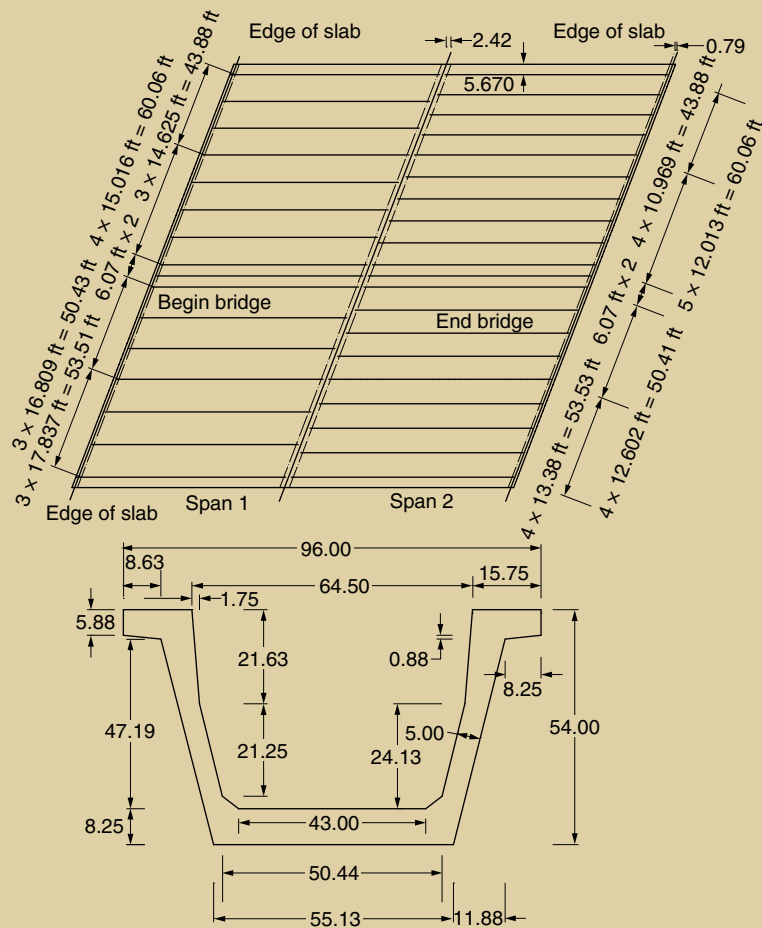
This diagram shows the plan and cross section for the Harris County FM 1960 underpass in Texas. Note: All measurements in the cross section are in inches. 1 ft = 0.305 m.
